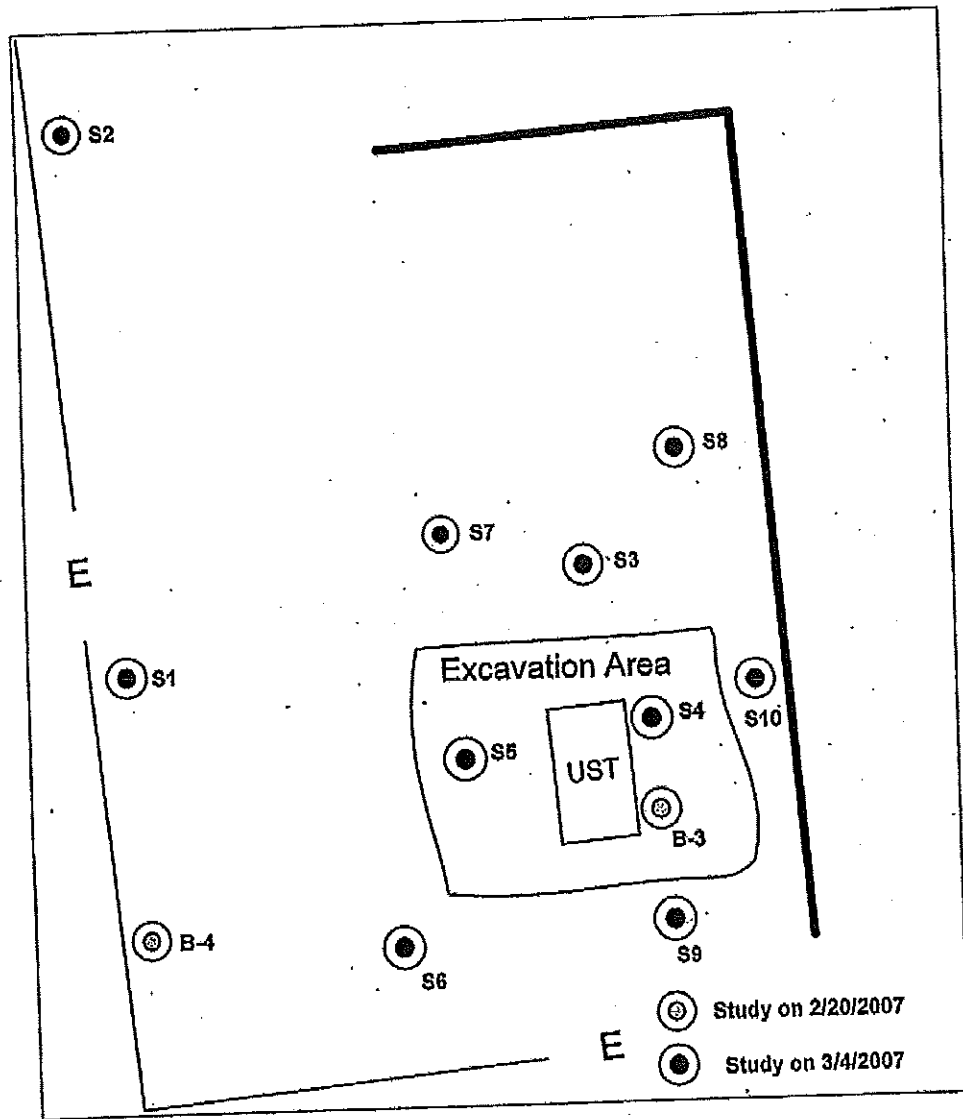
Location map of the heating oil underground storage tank (UST) and the extent of soil excavation. The Excavation started on October 16, 2008, and completed on October 21, 2008
